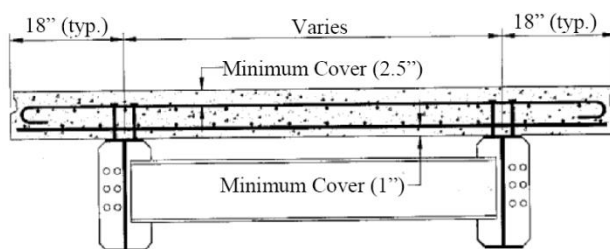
Typical cross section of an Inverset™ deck unit.
